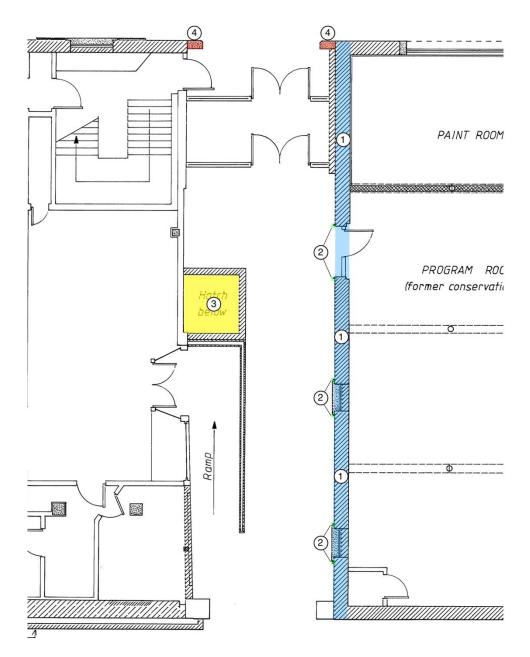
An annotated copy of the ground floor plan, infill portion. North is to the top.
